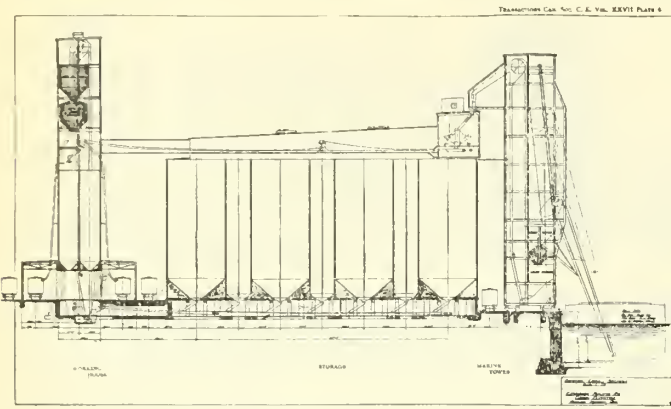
Longitudinal sectional view of C.P.R. elevator at Port McNicoll, Ontario.
